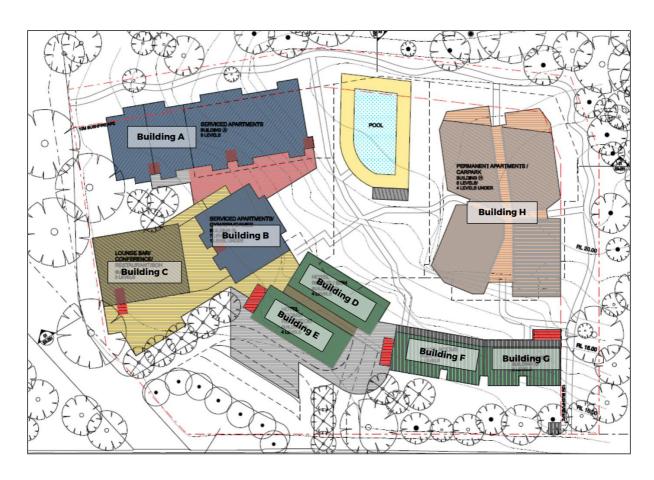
| Approved Concept Plan Layout (Source: Proponent's Modification Report)
